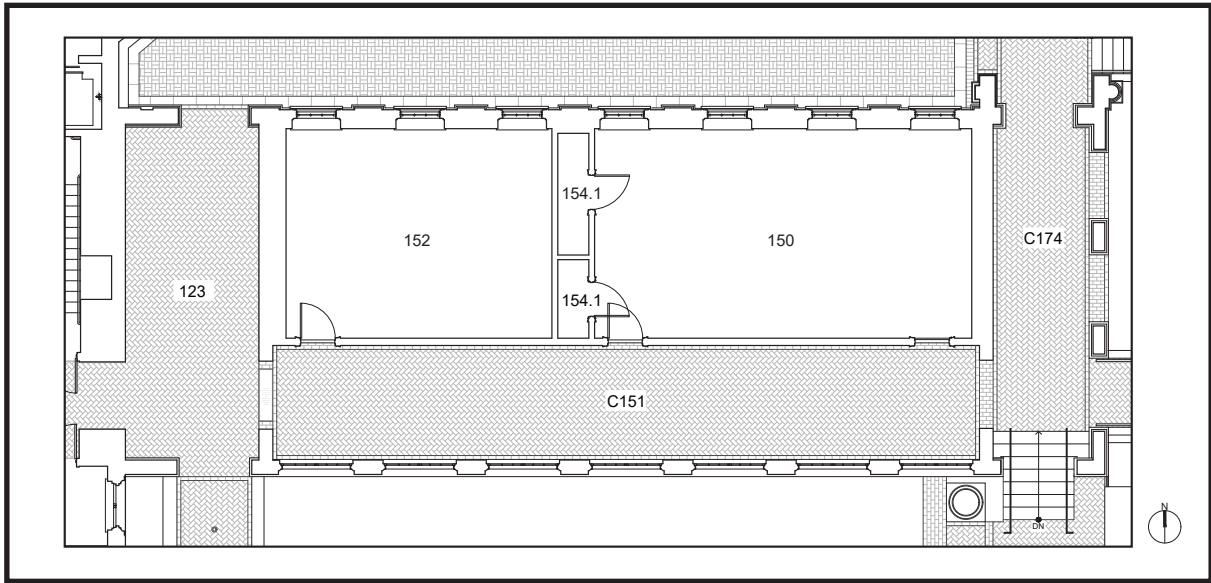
Detail of ground-floor plan of the southeast wing (not to scale).
